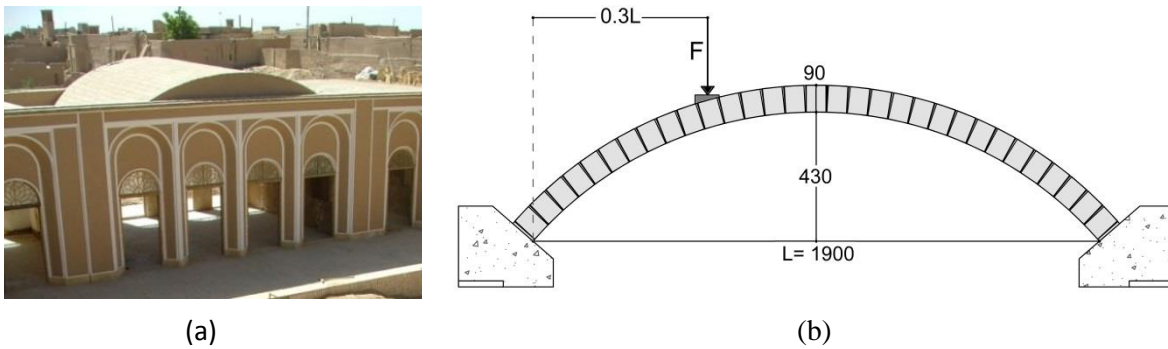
(a) Adobe house in Yazd; (b) Adopted vault geometry and load arrangement
